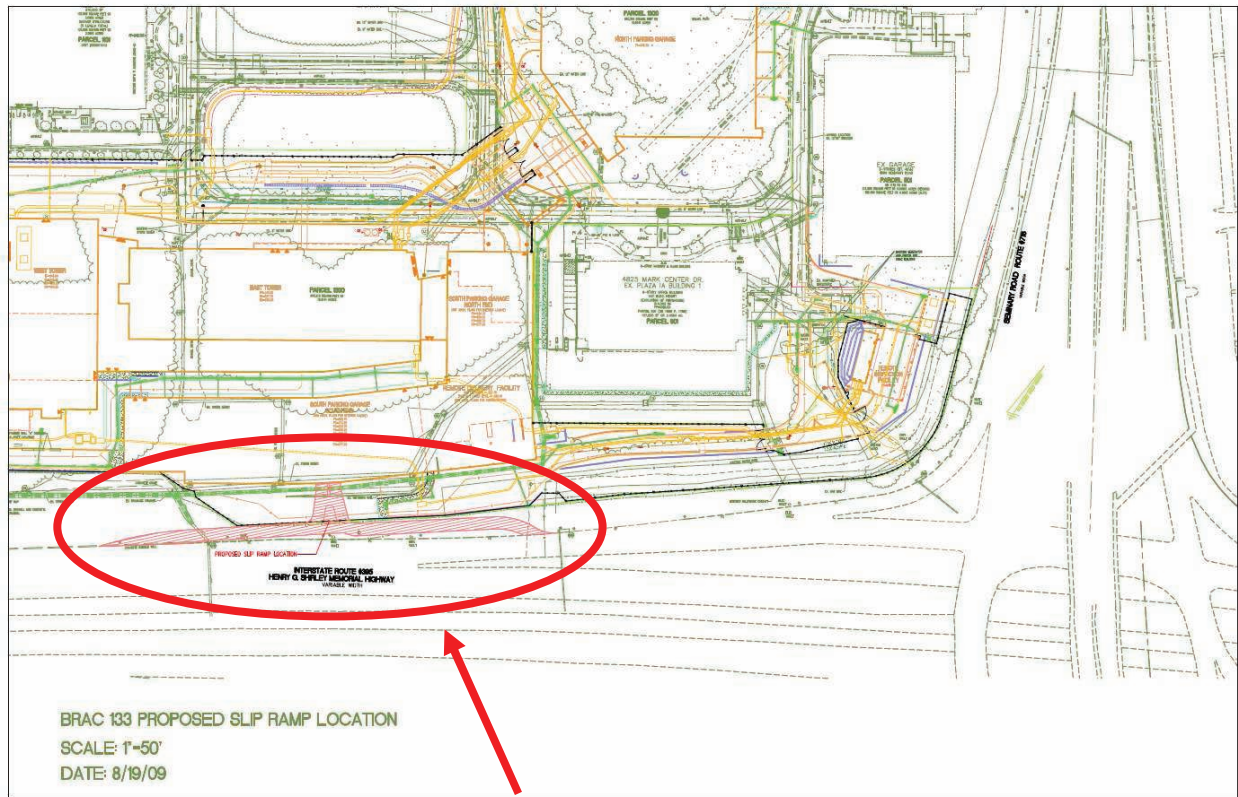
2013 Conditions with New Ramp to the South Parking Garage (Concept 1) Lay Out
